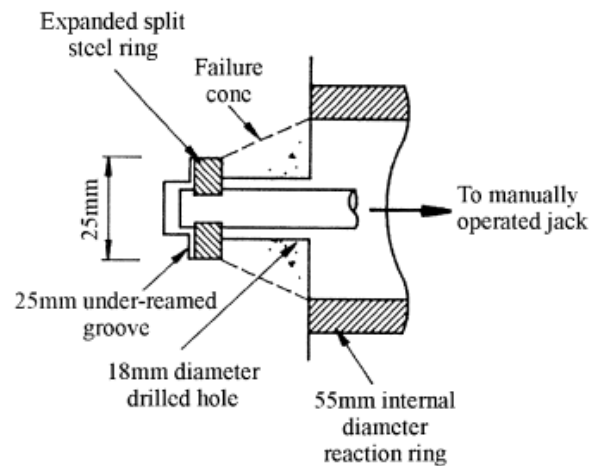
CAPO test arrangement (Bungey and Soutsos, 2001)
